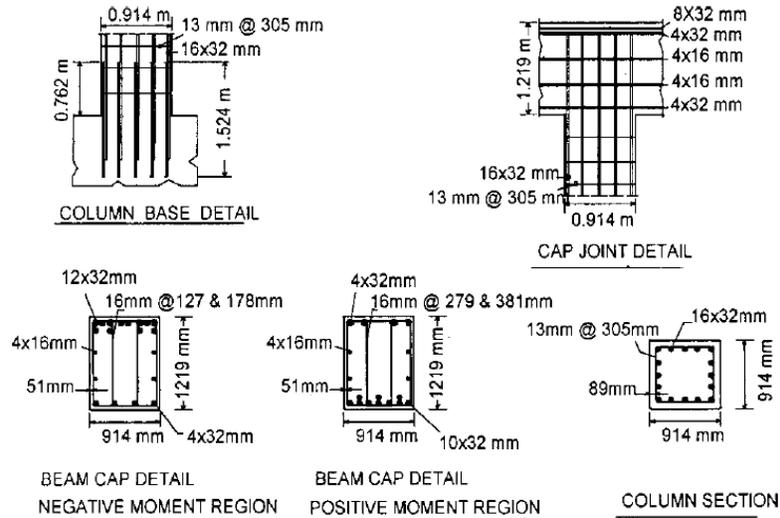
South Temple Bridge bent reinforcement details (Pantelides and Gergely, 2002)
